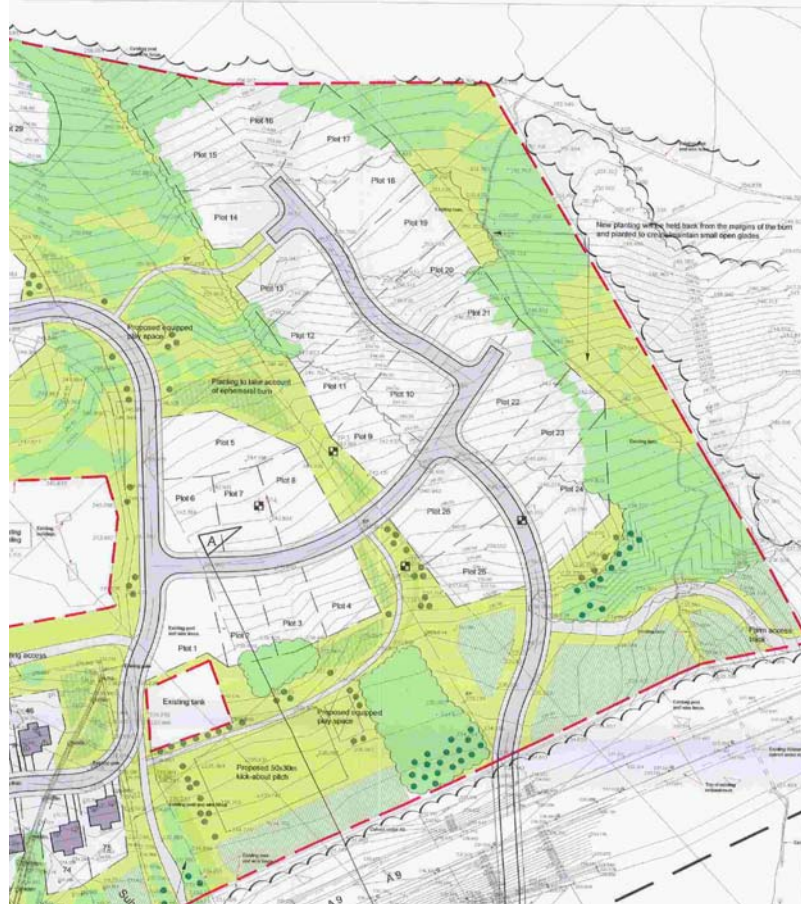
Extract from overall site layout plan, showing Zones 1 (plots 9 - 26); 2 (plots 1 - 4 and plots 5 - 8).
